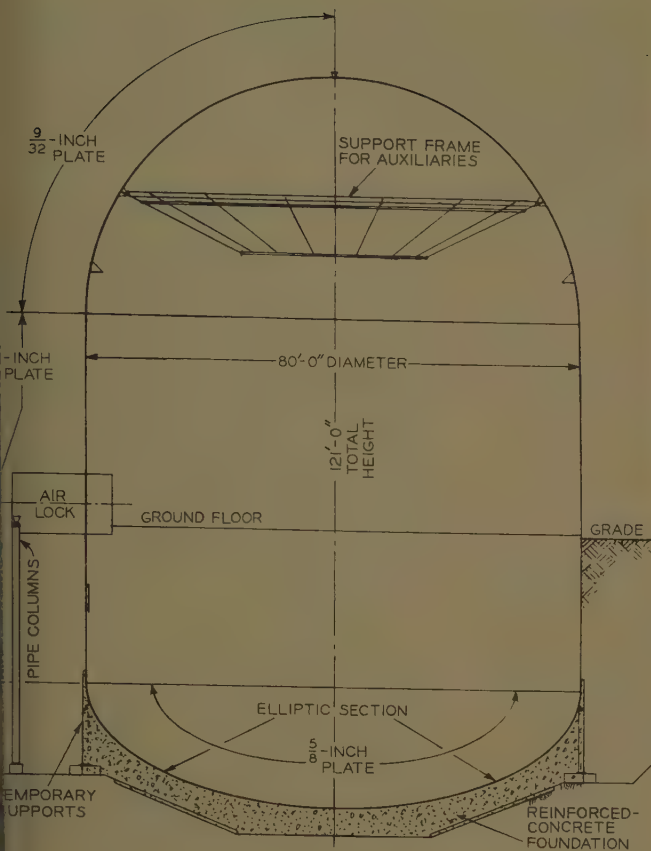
(left). Section through welded-steel reactor-containment vessel
